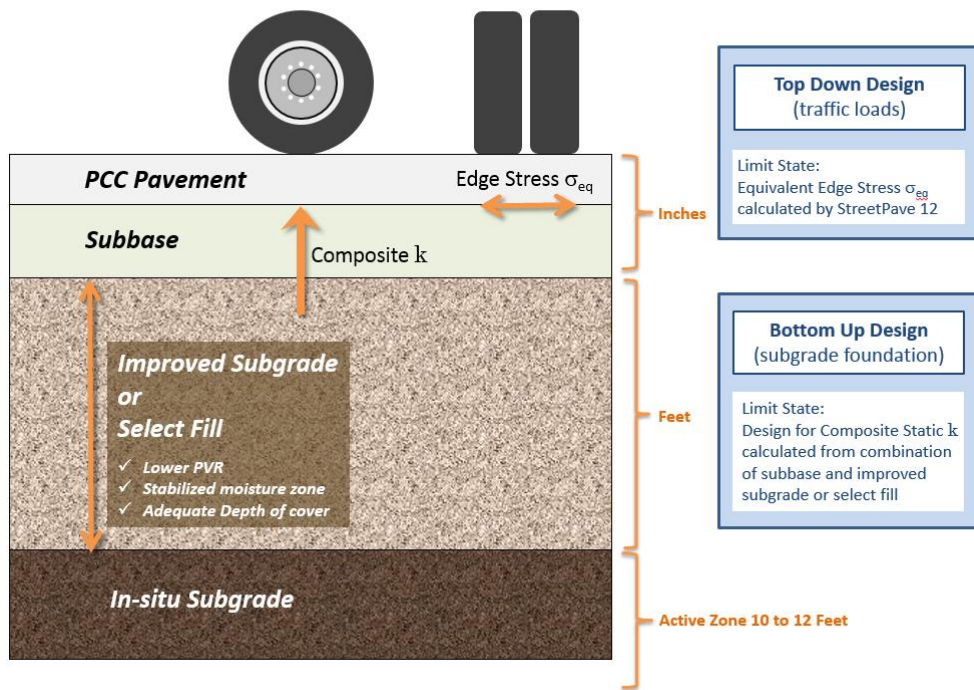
Top Down and Bottom Up Pavement Design – Rigid Pavement
